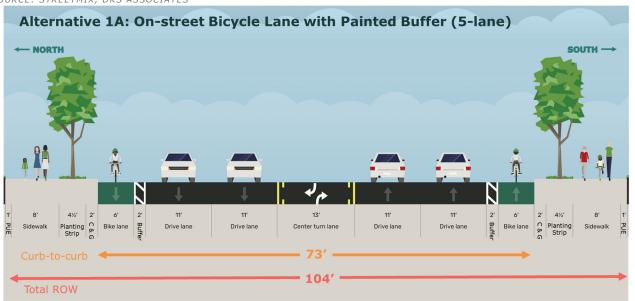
FARMINGTON ROAD CORRIDOR - ALTERNATIVE 1A: 5-LANE CROSS-SECTION (BLTS= 2, PLTS= 2)
